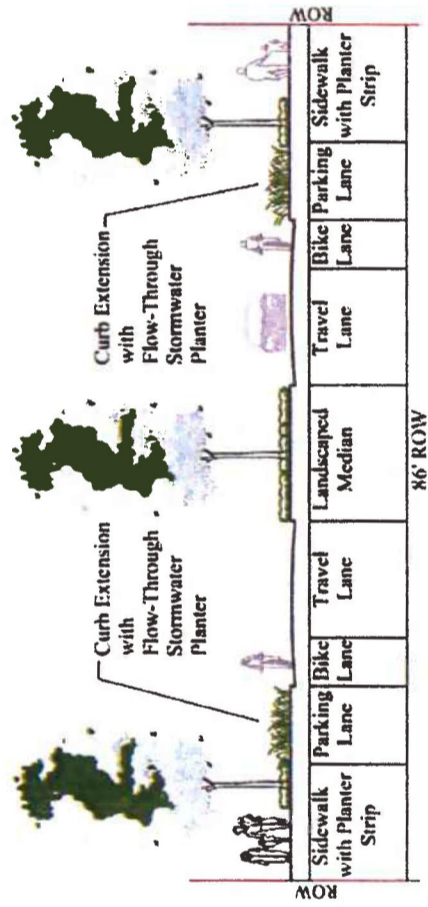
Ridge Parkway and Central Parkway Green Streets
